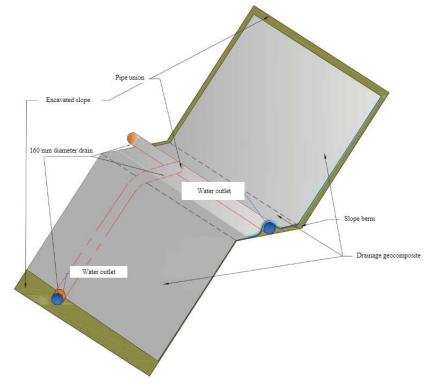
Drainage over the excavated slope berm (behind the reinforced fill).
